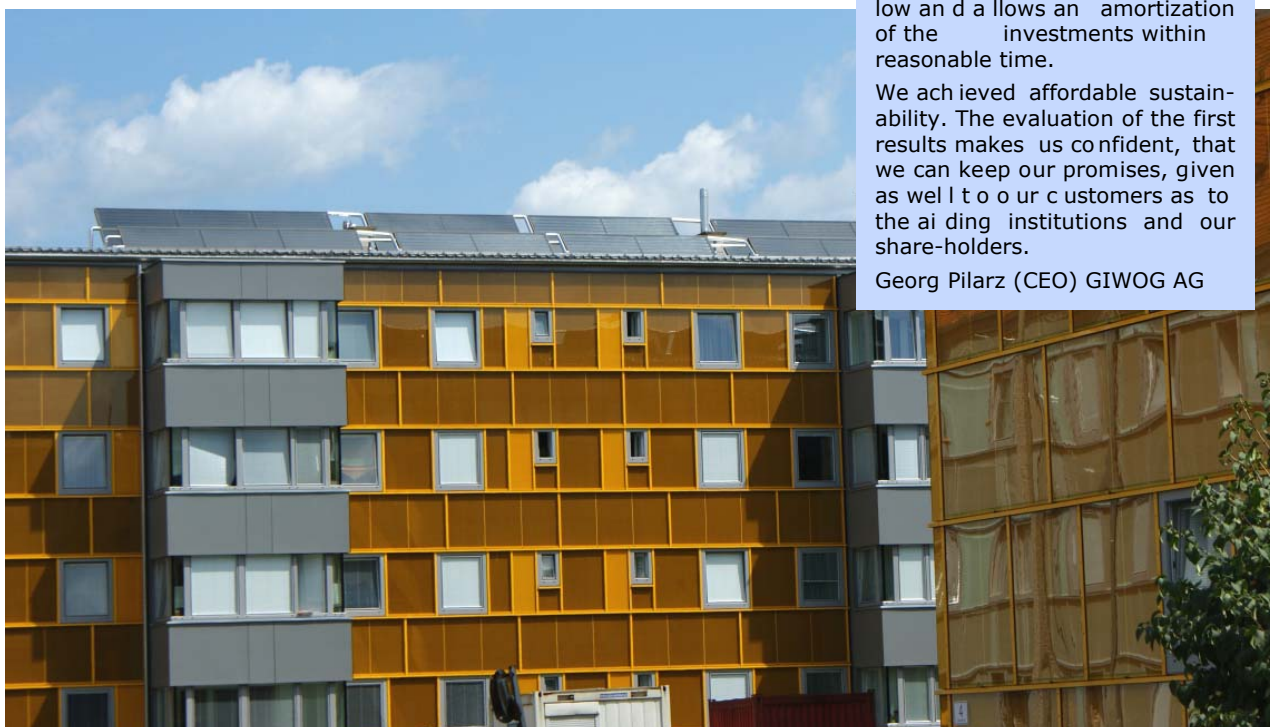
View on the finished façade – showing the new façade structure with integrated windows and balconies, and the solar thermal collectors on the flat roof
